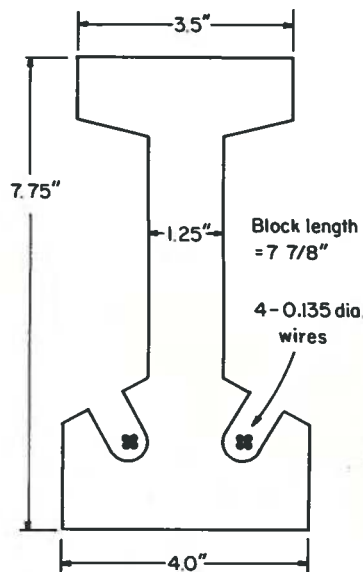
Section of concrete blocks used in the construction of pretensioned joists by the Hydro Electric Power Commission of Ontario.
